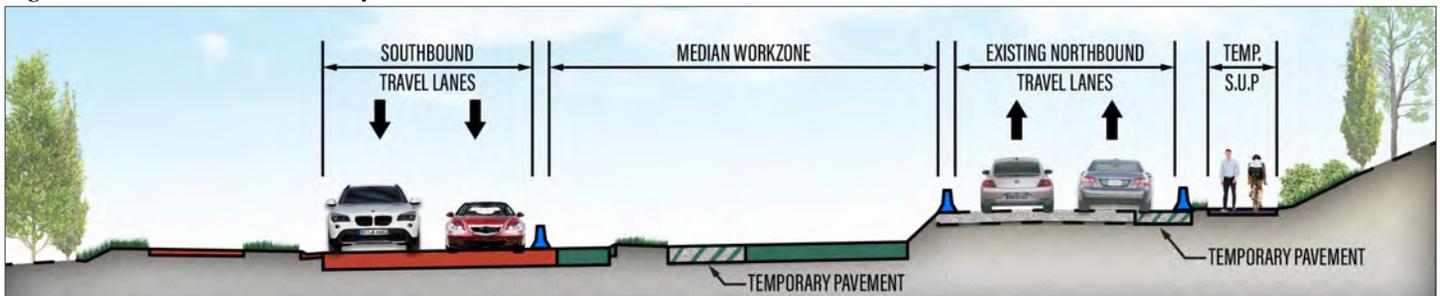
Phase 2 Roadway Section Sta 347+00
